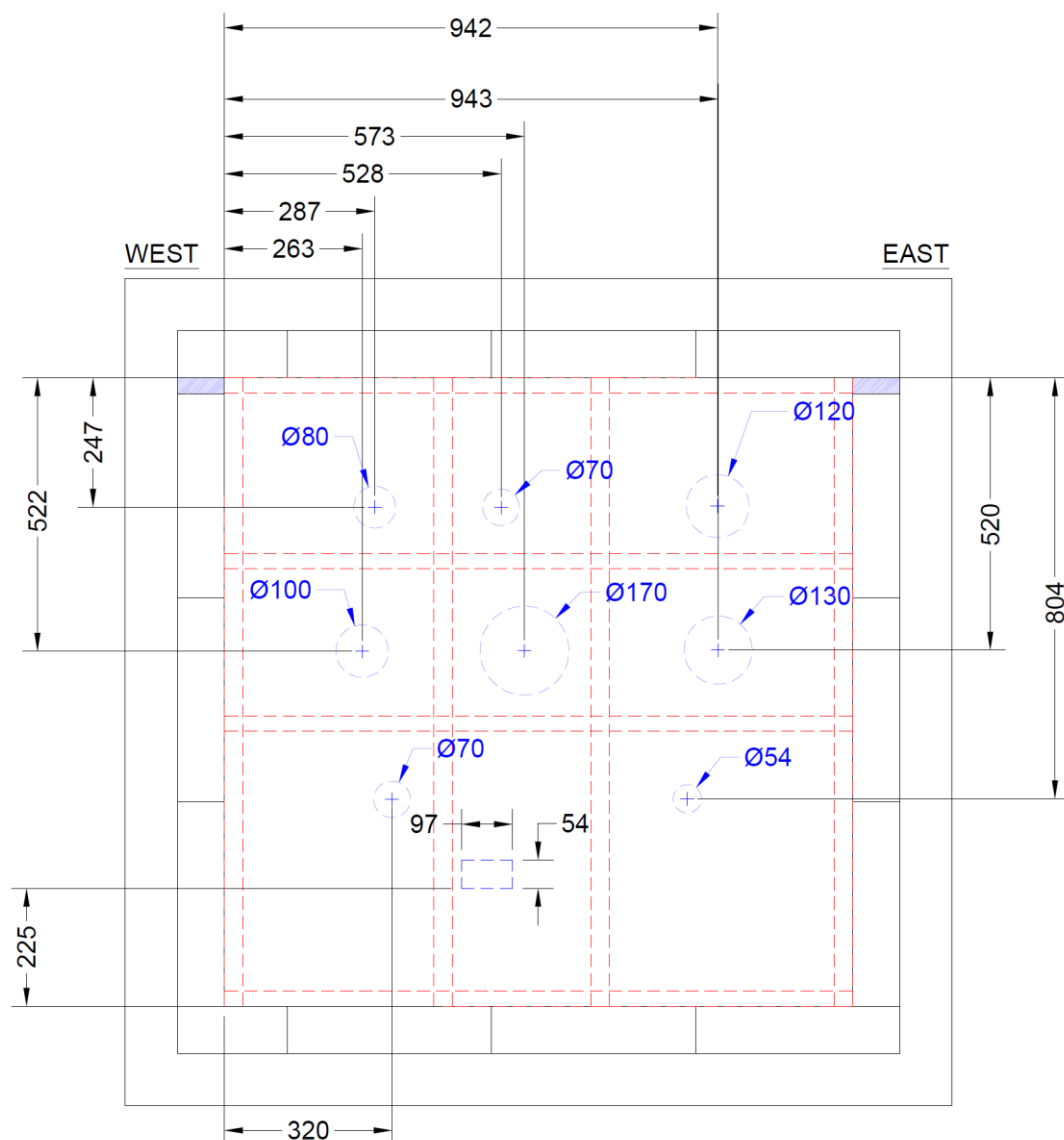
Plan view of test specimen on unexposed side (core hole and wall frame)
